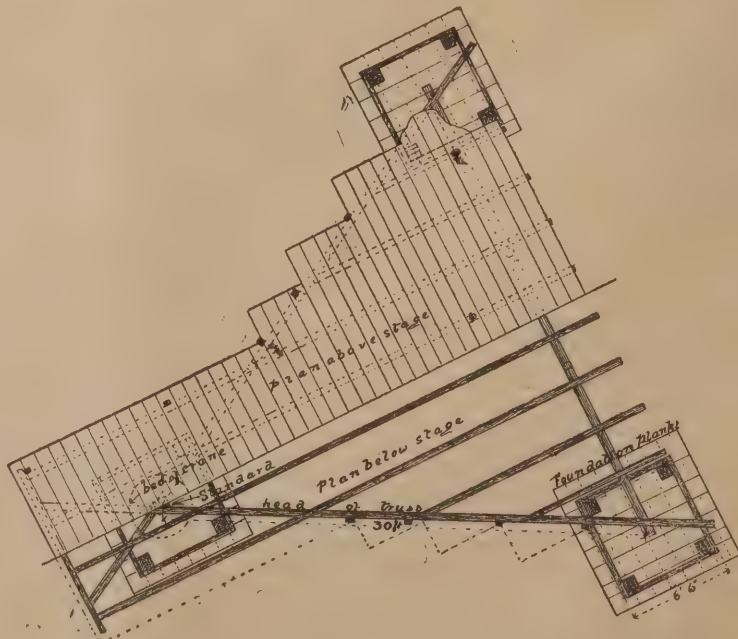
PLAN OF A DERRICK TOWER GANTRY.
